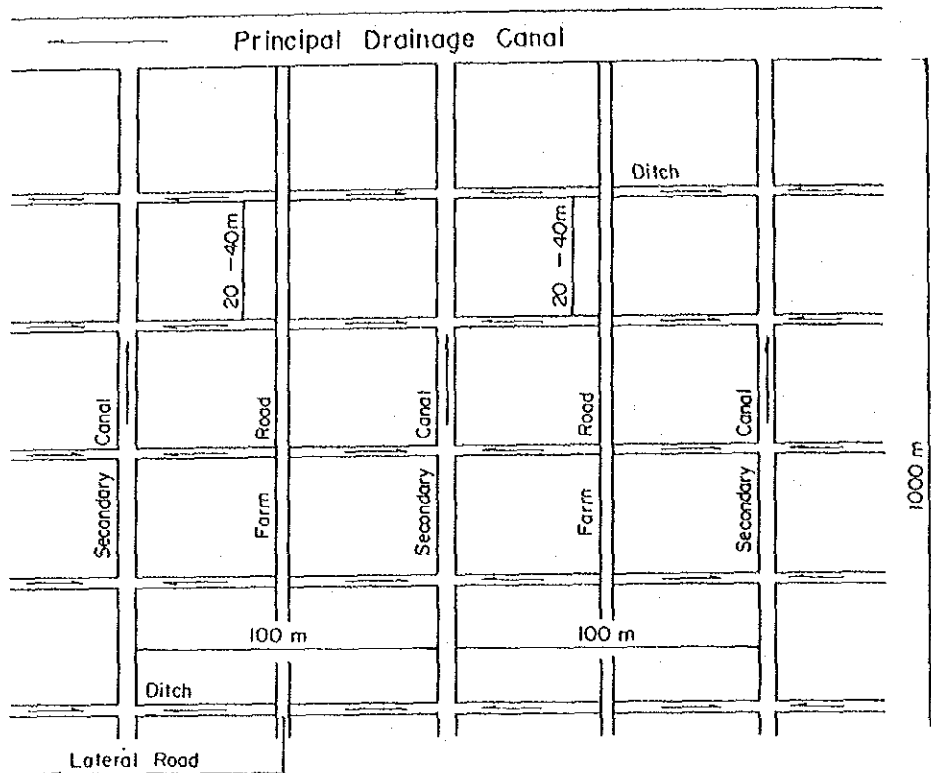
Existing Drainage Network in Banana Plantation
